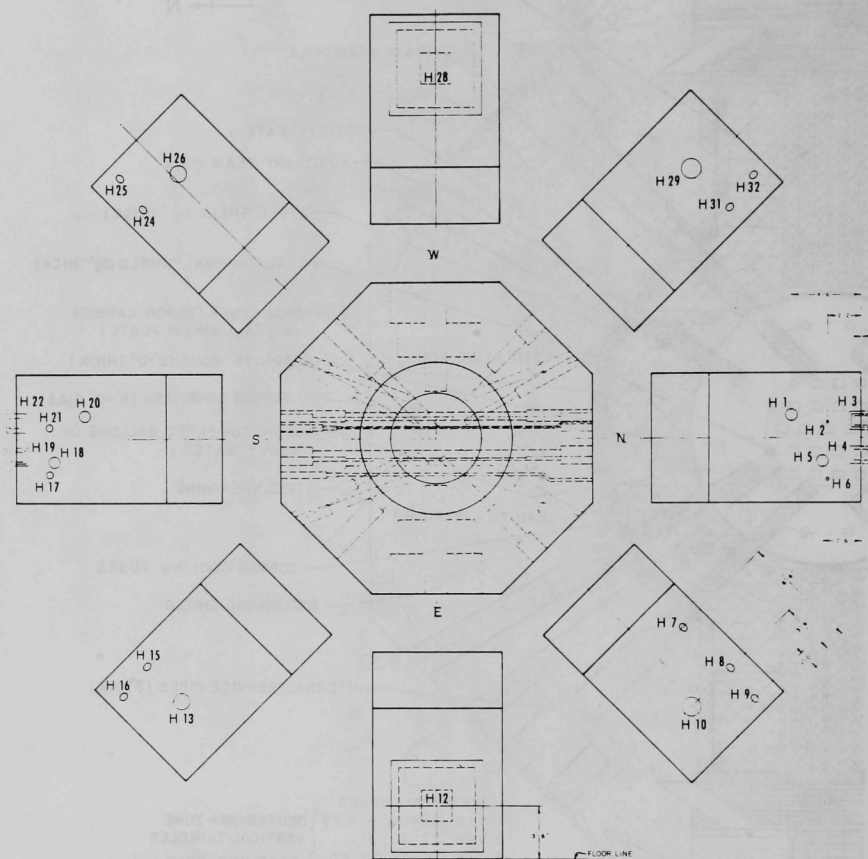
CP-5 Horizontal Experiment-Hole Plan.
